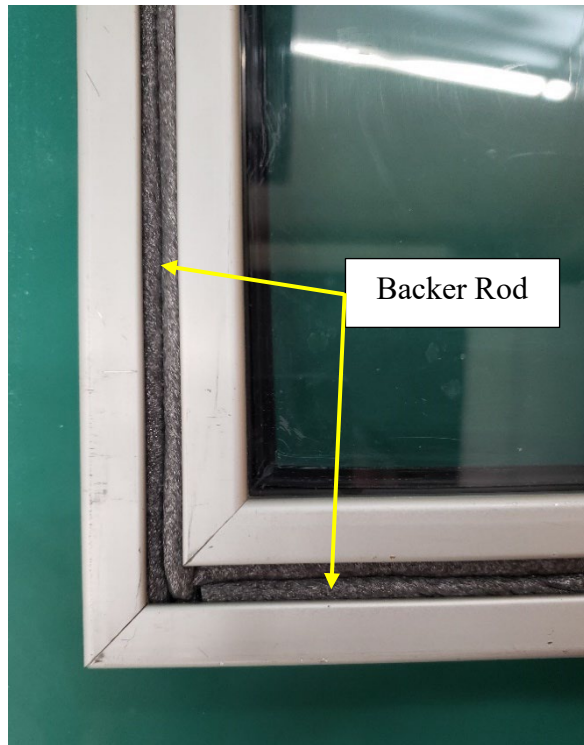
Backer rod installation to fill internal frame groove to prevent water intrusion
